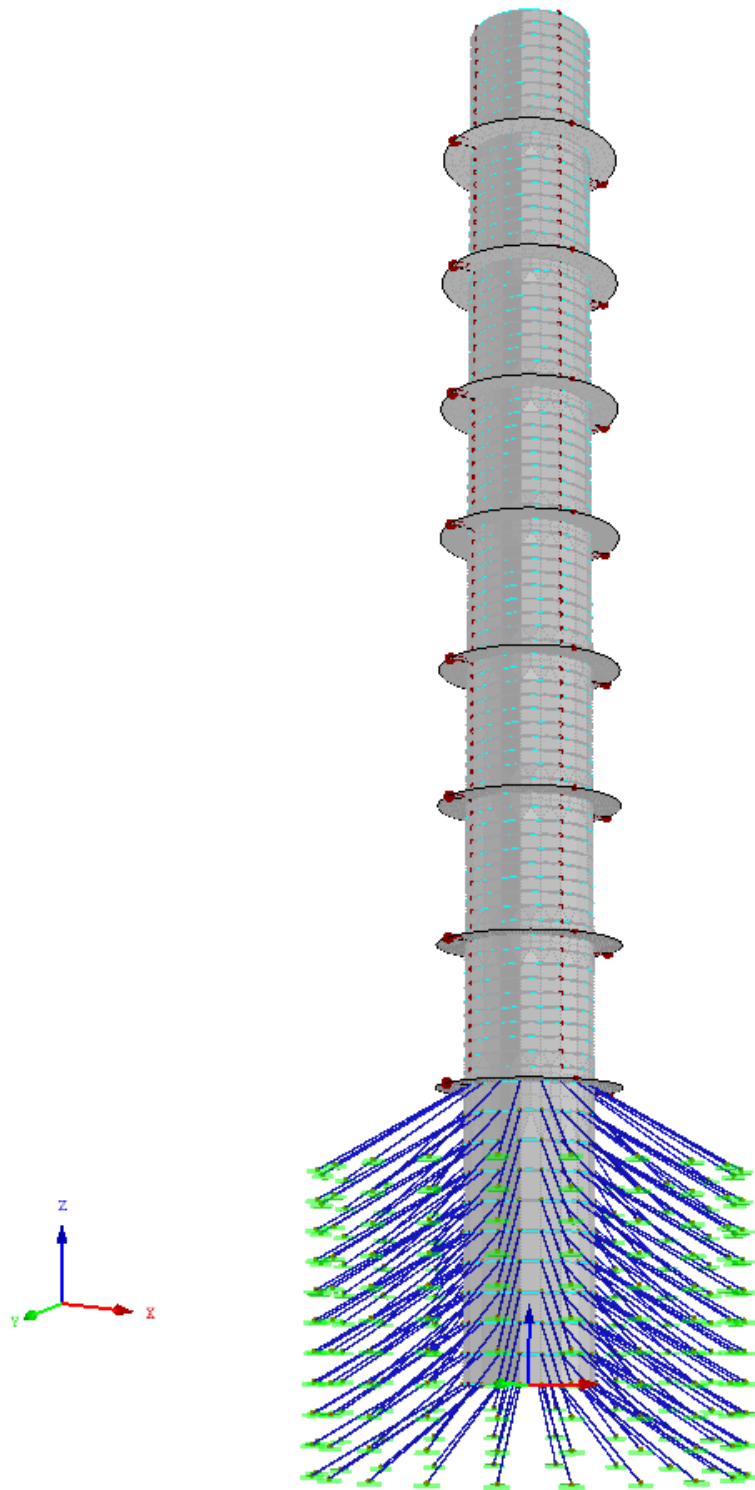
Simulation of a shaft plug showing the upper shaft section designed for sealing [3].
